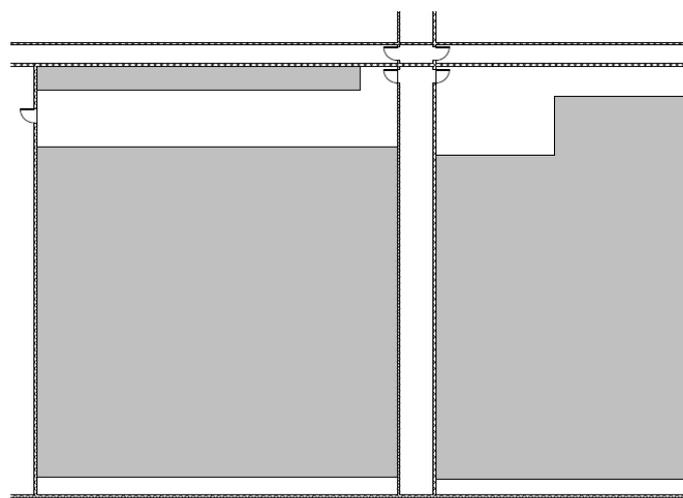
Floor plan for Storage II. The storage room with a paper-based archival collection is on the right and the room with a mixed material collection is on the left. The areas with movable compact shelves are marked in grey.
